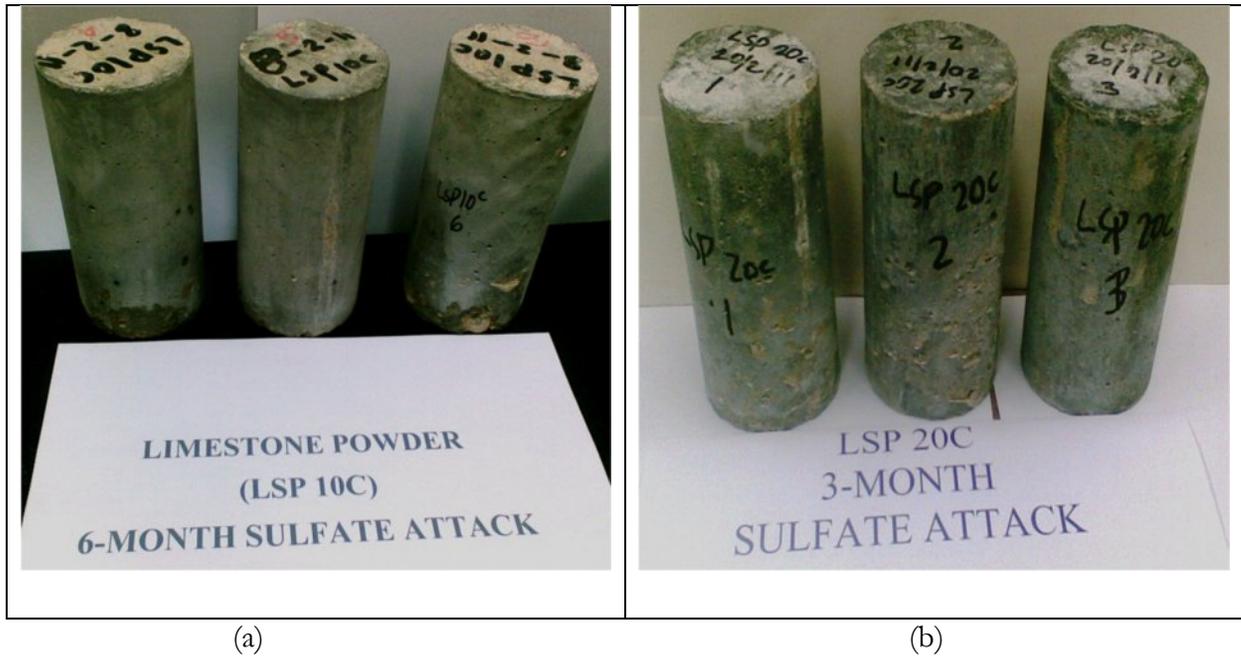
7: (a) SCC specimen showing spalling at the corners and (b) another SCC specimen showing exposure of the concrete due to softening and break-off.
